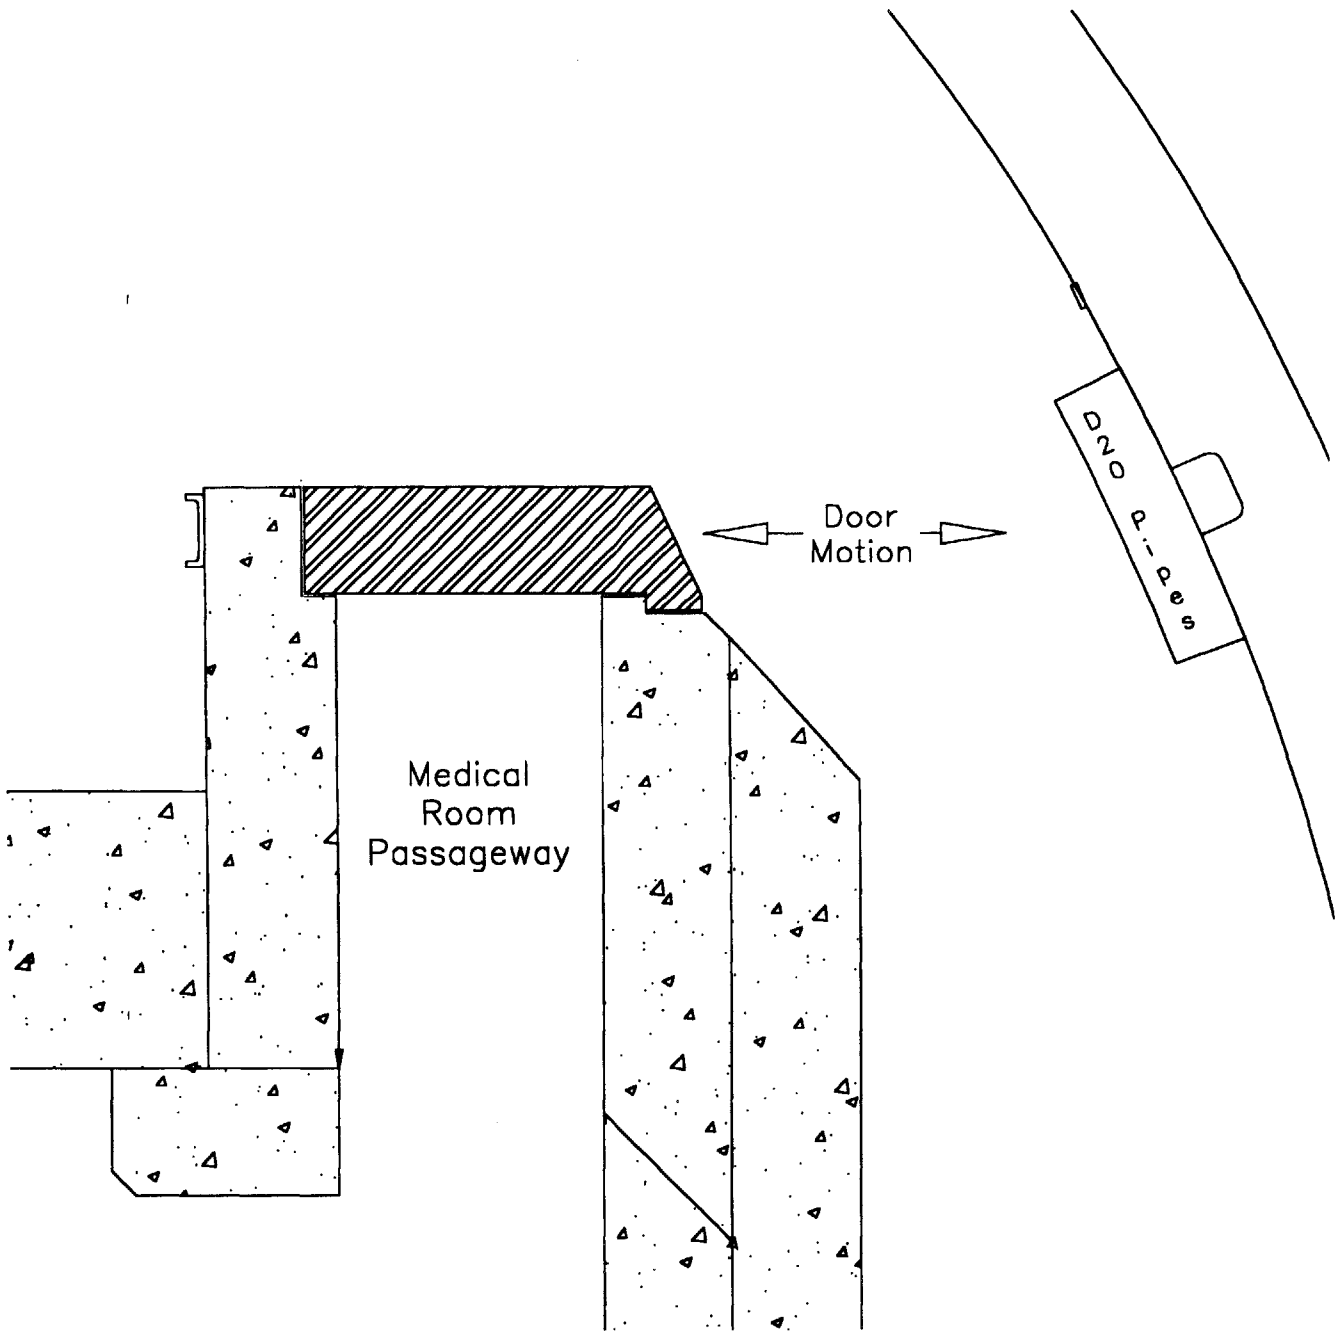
Chamfered Sliding Door -- Plan View, Closed Position (support structure for door not shown).
